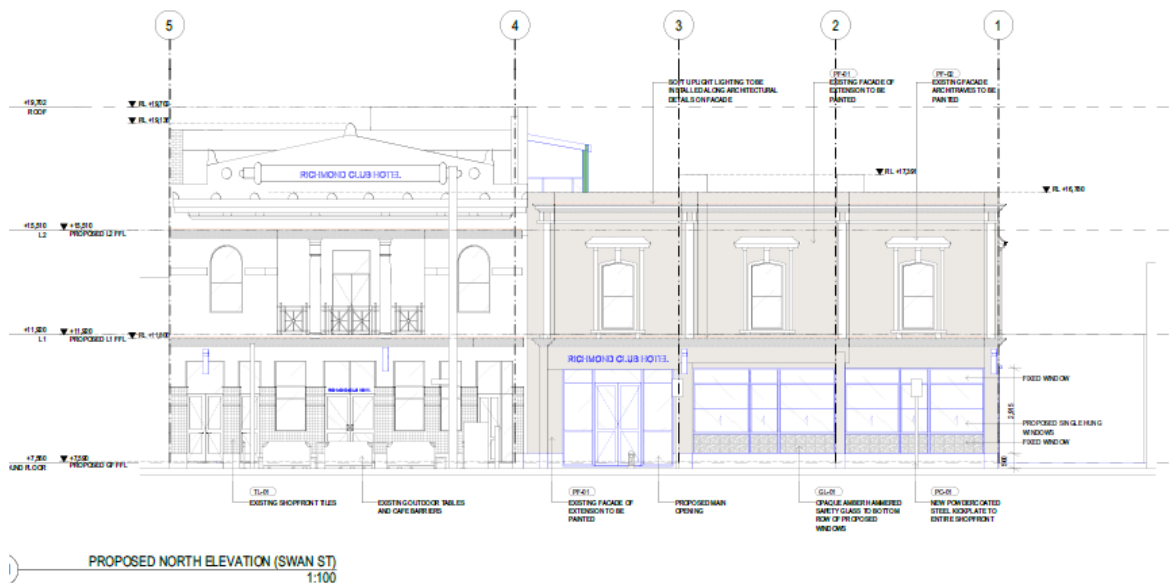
Proposed north elevation, noting changes to the ground floor shopfronts to 94-98 Swan Street.
